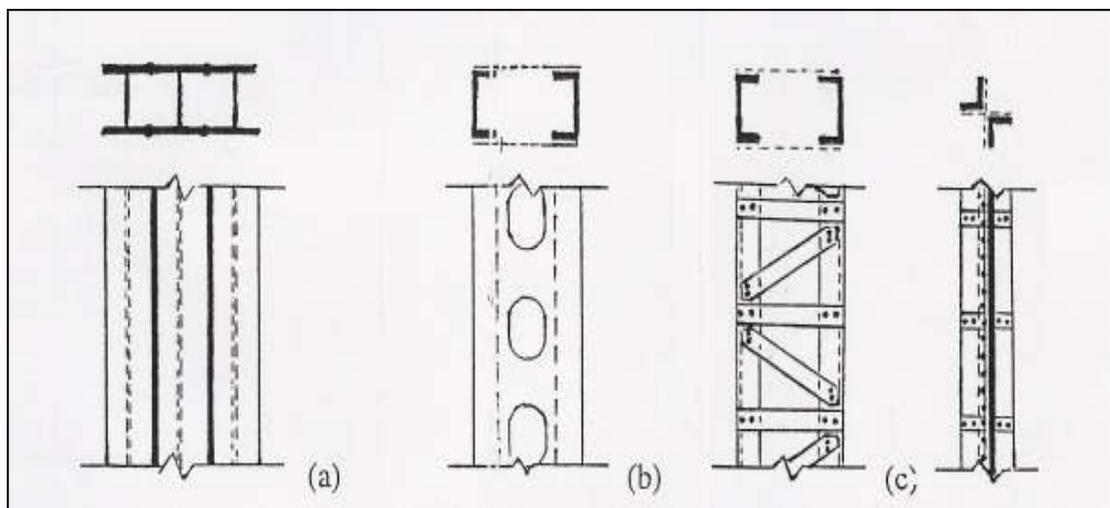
Built-up columns; (a) solid wall column, (b) solid wall column with perforated cover plates and (c) open type column (Source: Keyder, 1993)
